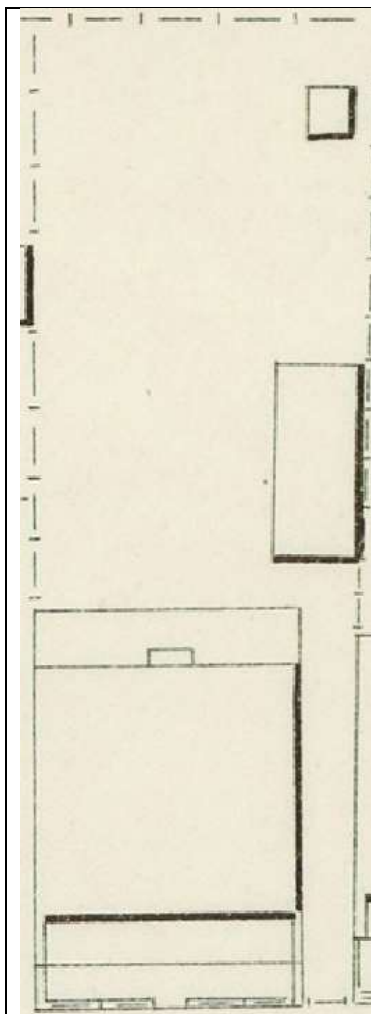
The building footprint in the 1889 NSW Department of Lands, plan, SLNSW
